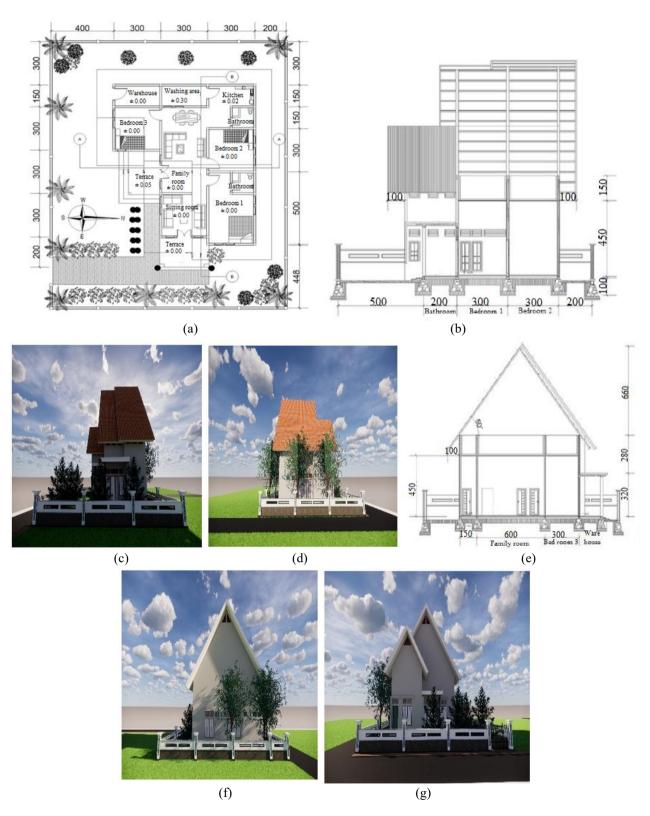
Design model: (a) House plan; (b) Section A-A; (c) Front view; (d) Rear view; (e) Section B-B; (f) Left view; (g) Right view
